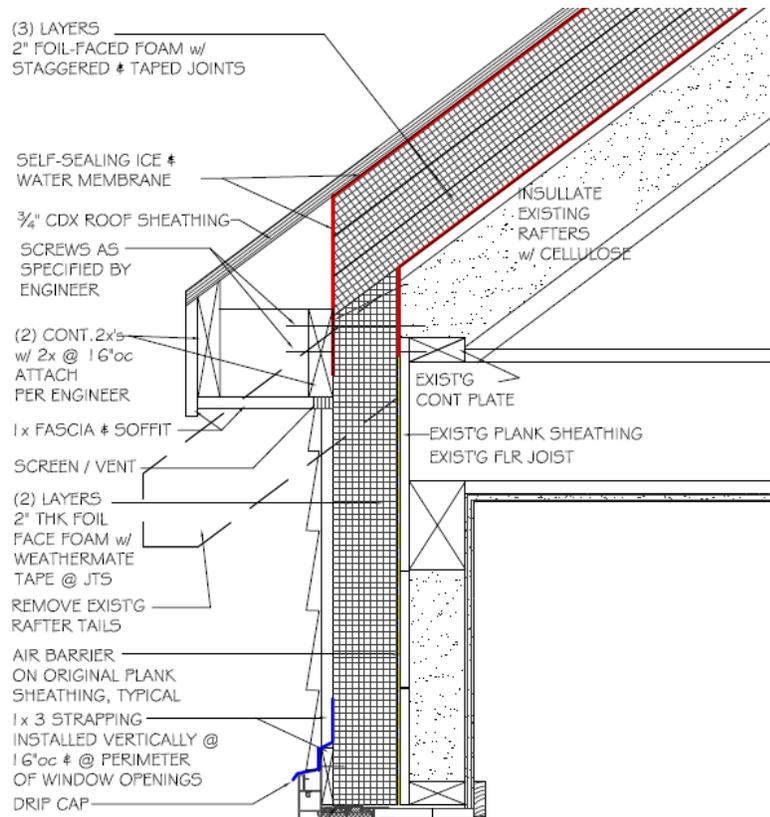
Details of roof/wall intersection for Byggmeister Belmont whole-house DER
